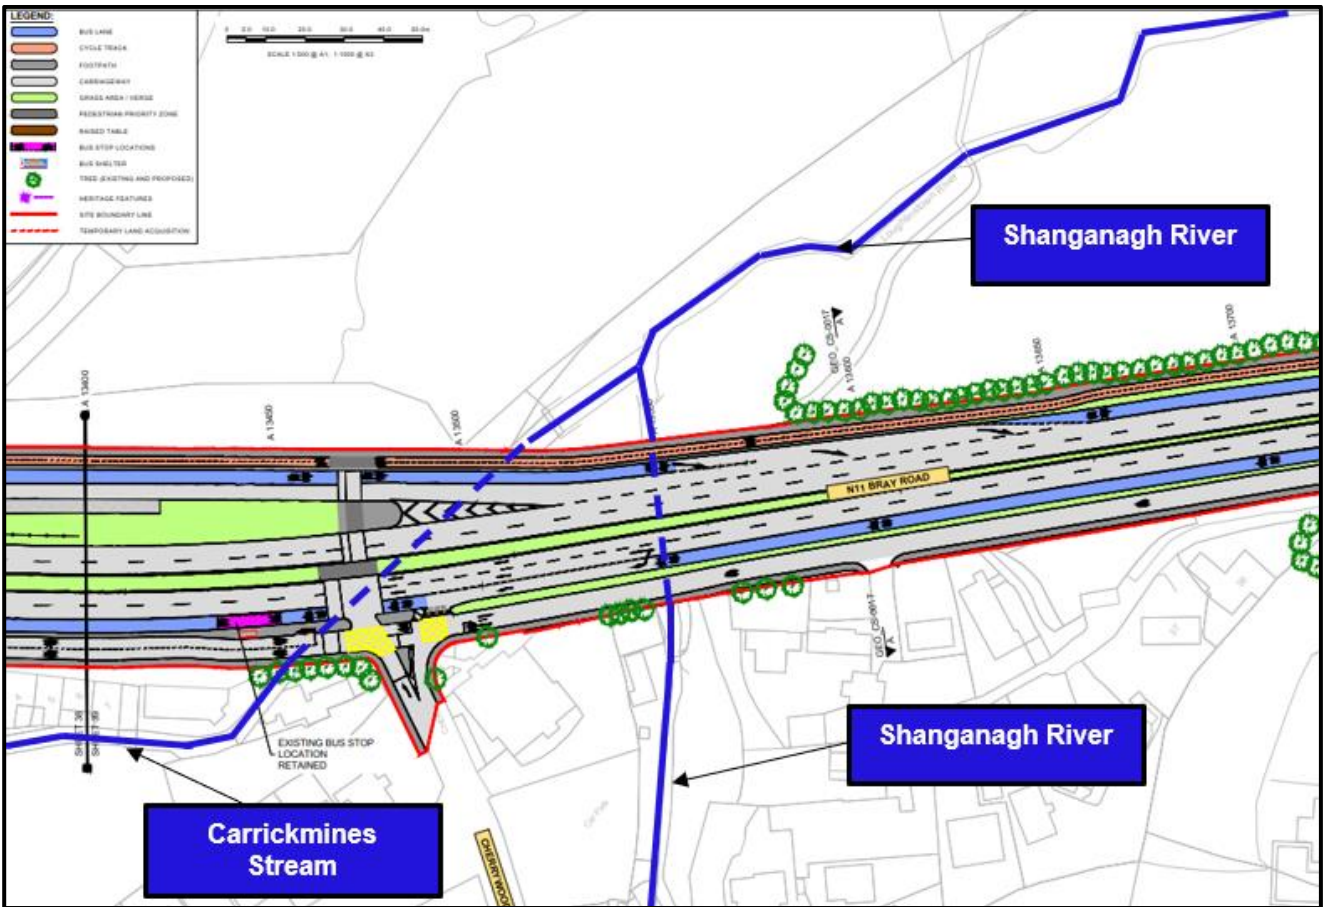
Proposed works at Bray Road, Loughlinstown
